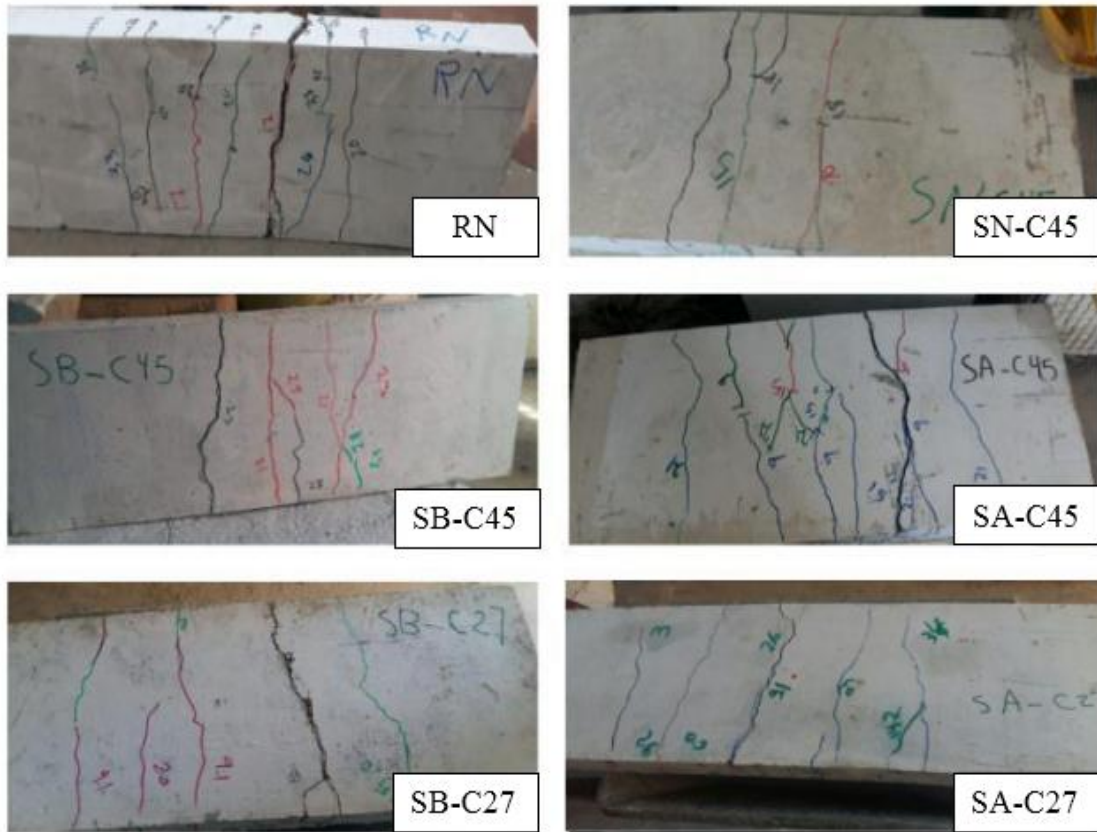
Cracks Patterns for Solid Slab and Sandwich Slab with Continuous Shear Connectors at Lower Face of Bottom Layer
